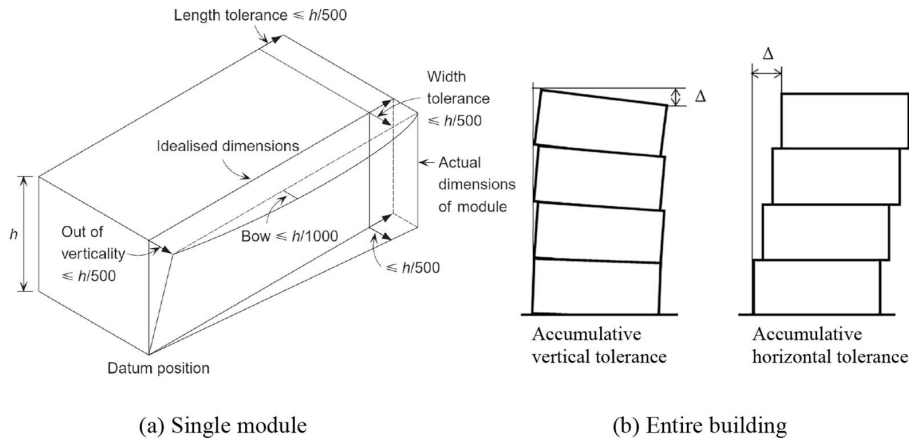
Construction tolerances of modular buildings [1]
